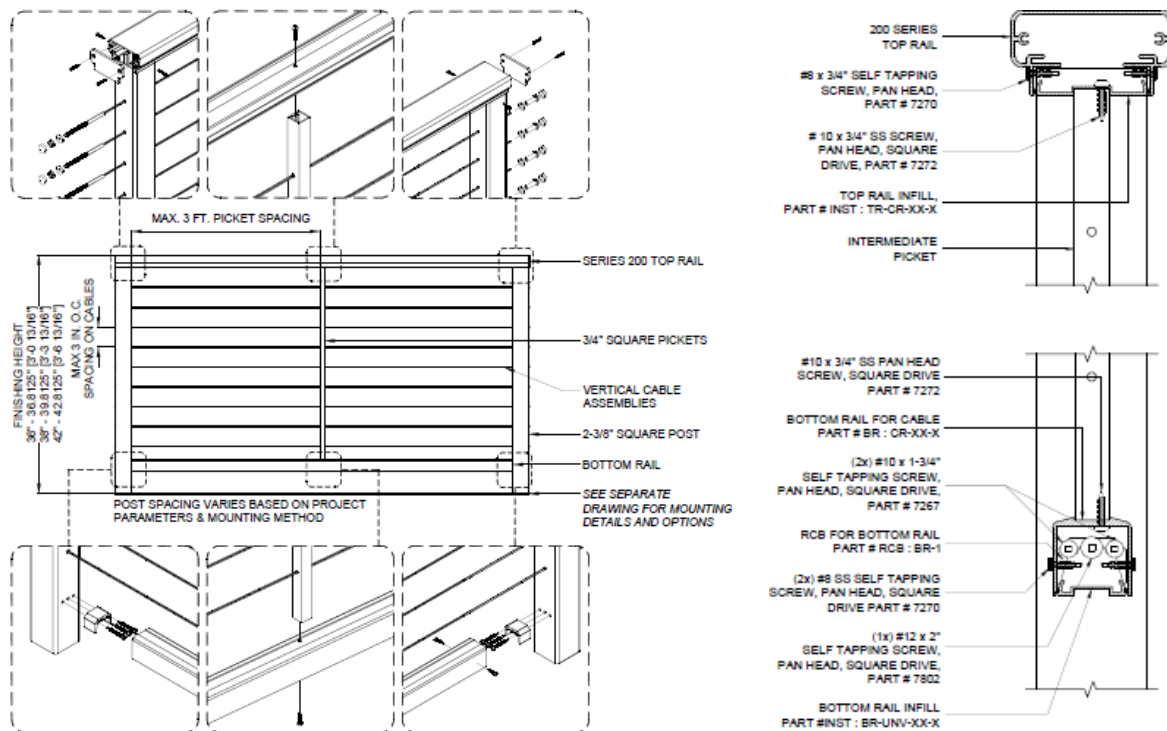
Series 200, 300, 350 and 450 Horizontal Cable Assembly (Series 200 shown with bottom rail)
